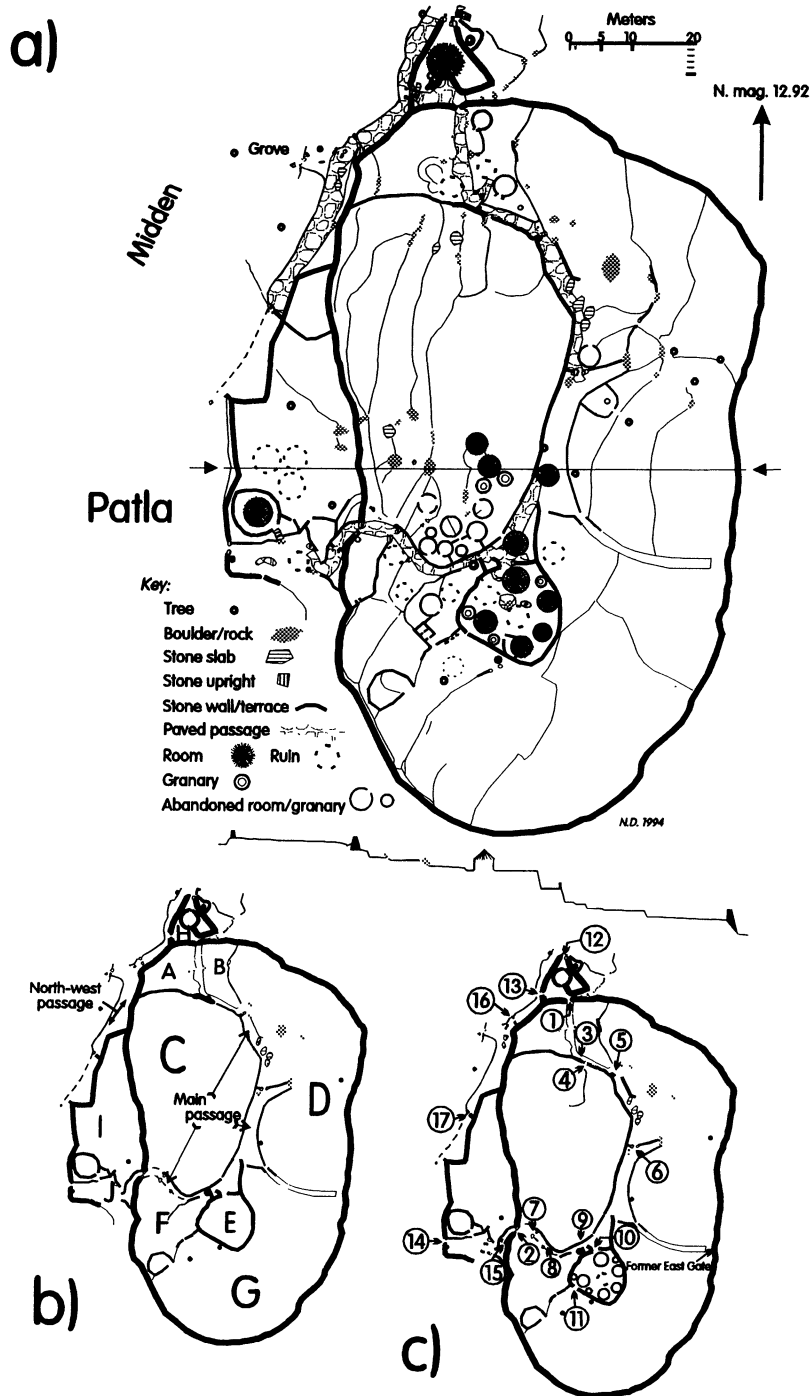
a, Plan and east-west section of the xidi house (vertical scale of section approximate); b, sectors of the xidi house complex: A, now in ruins, the quarters of the xidi's sons between leaving their mothers' rooms and marriage; B, now in ruins, a gate-keeper's room, bull and goat pens, stabling for the xidi's horse, and the place where the xidi is dressed before certain public appearances; C, terraced fields adjacent to the western wall and a large flat area, the latter (created by the construction of the tallest terrace revetment in the complex) being where the majority of former xidis' wives and small children were housed (most structures now much decayed); D, mainly fields but with some structural remains, said to be the rooms of old women taken in by the xidi; E, the inner house, where the xidi lives with the wife who cooks for him; F, ruined buildings and terraces; G, mainly fields but with some structural remains that included housing for wives; H, northern courtyard and Mbuk; I, guest accommodation; J, west entrance features; c, main gateways of the xidi house complex.
